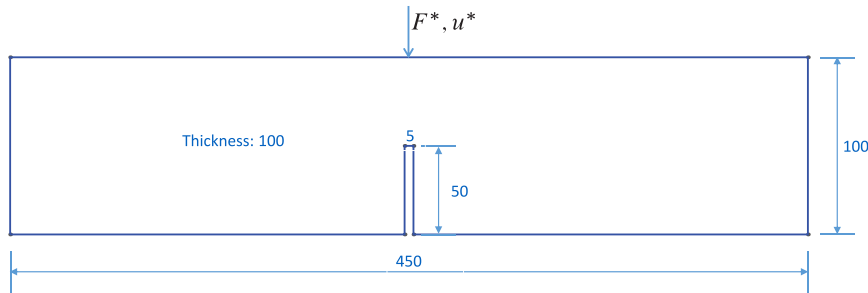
Notched concrete beam under mode-I failure: Geometry (unit of length: mm), loading and boundary conditions.
